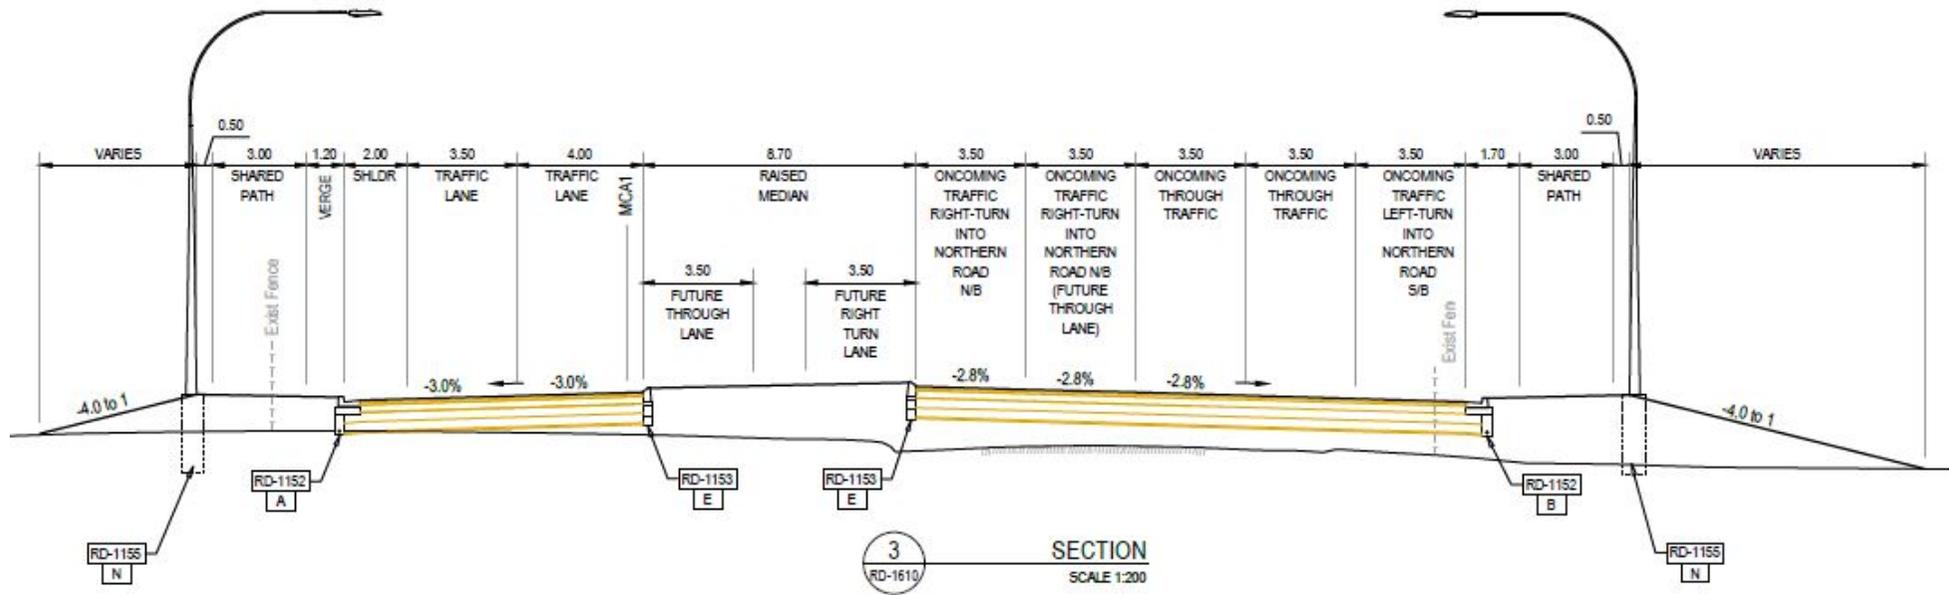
Typical cross section – Bringelly Road (about 380 m east of the existing The Northern Road / Bringelly Road intersection)
